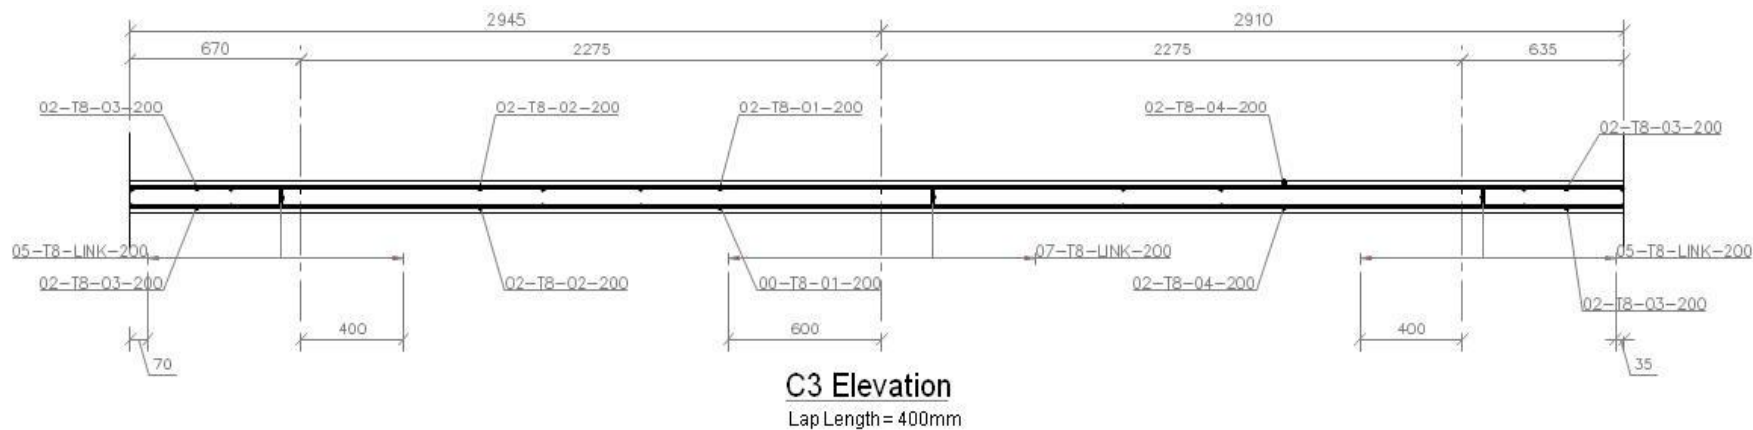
Elevation of reinforcement detailing of sample C3.
